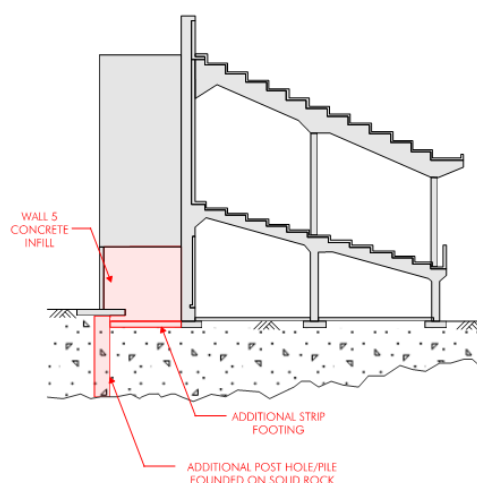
Strengthening of Wall 5: Grid 6 and 7
